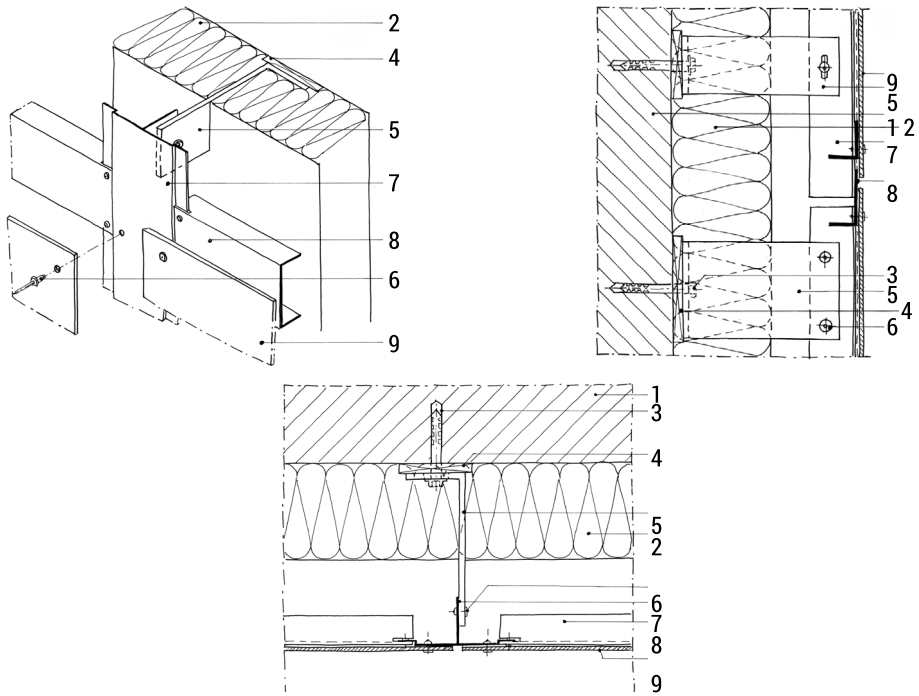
Point fixing system through the cladding, with mullions and transoms. Key: 1. Load bearing layer; 2. Insulation panel; 3. Expansion anchor; 4. Bracket thermal break; 5. Fixing bracket; 6. Rivet; 7. T-shaped aluminium mullion; 8. U-shaped aluminium transom; 9. Cladding (Source: own elaboration)
